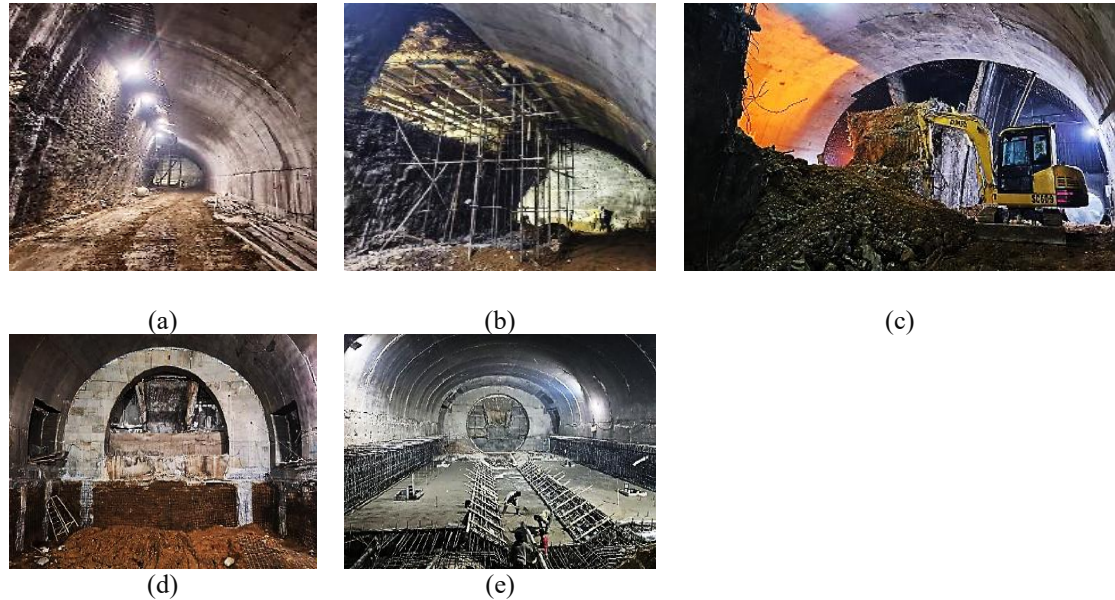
The construction sequence in the southern section of Naghsh-e Jahan Station, (a) construction of side arch walls, (b) removal of the lattice girder in the central drift, (c) complete removal of the central drift, (d) excavation of the lower section, (e) completion of the central core cross-section through foundation construction.
